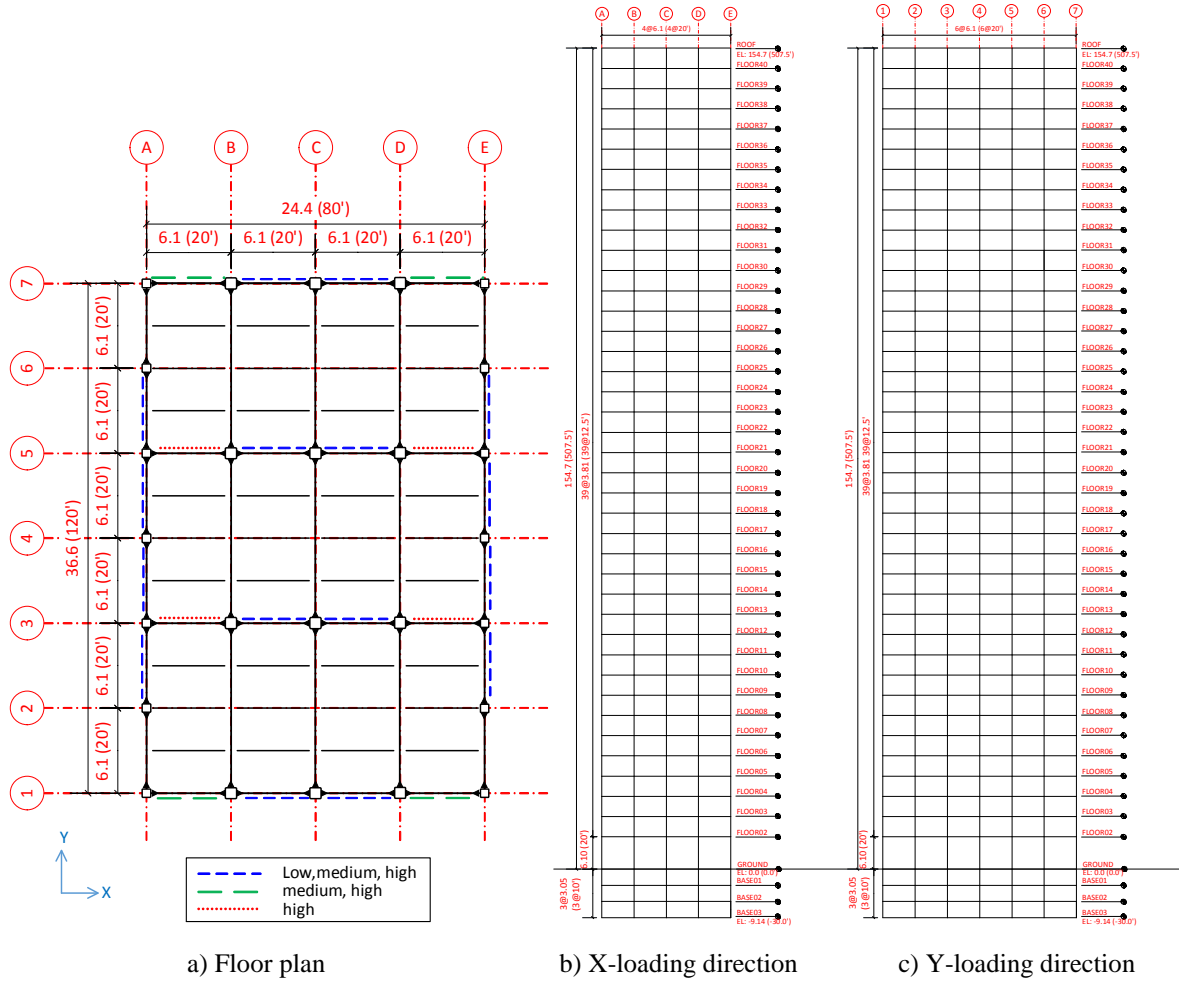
Floor plan and elevation views of the building, dimensions in m (ft)
